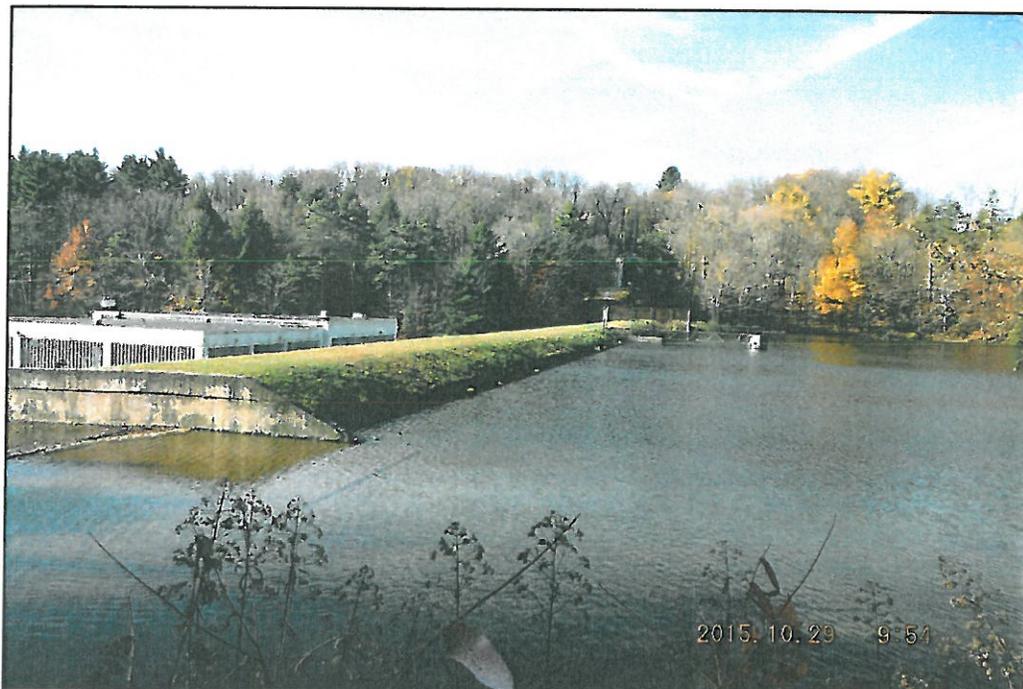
Spillway Entrance and Upstream Embankment looking Southwest
